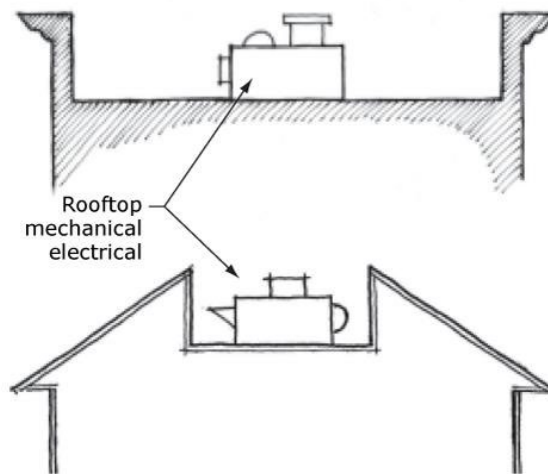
C.123.060-B – Rooftop and ground-level equipment must be screened from view along public rights-of-way. Here mechanical systems are hidden by cornice and roof elements.
